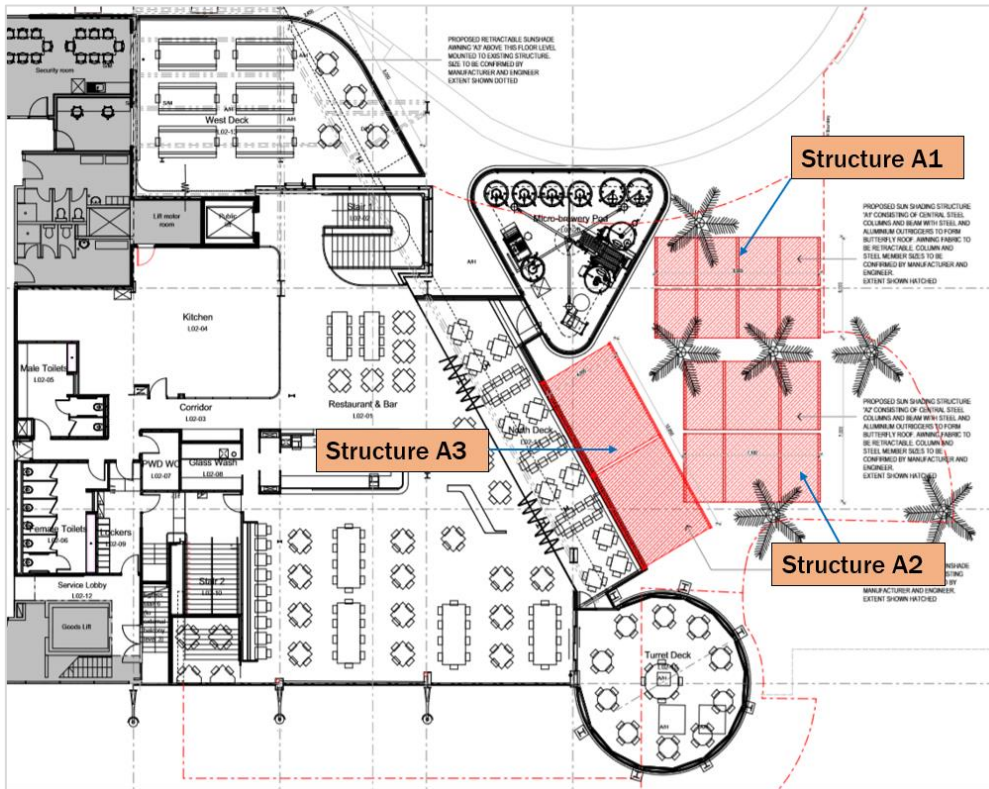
Location of Tenancy 5 OPT building shade structures – ground floor (Source: Greenlight Design)
